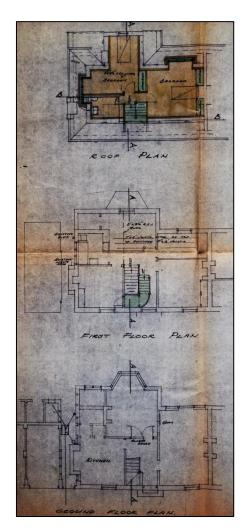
1965 proposed alterations to 115 Willifield Way (Hampstead Garden Suburb Trust)
